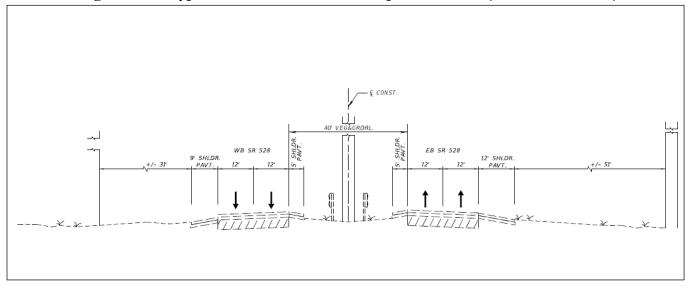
Typical Section at SR 528 Underpass at SR 417 (Structure #750470)
